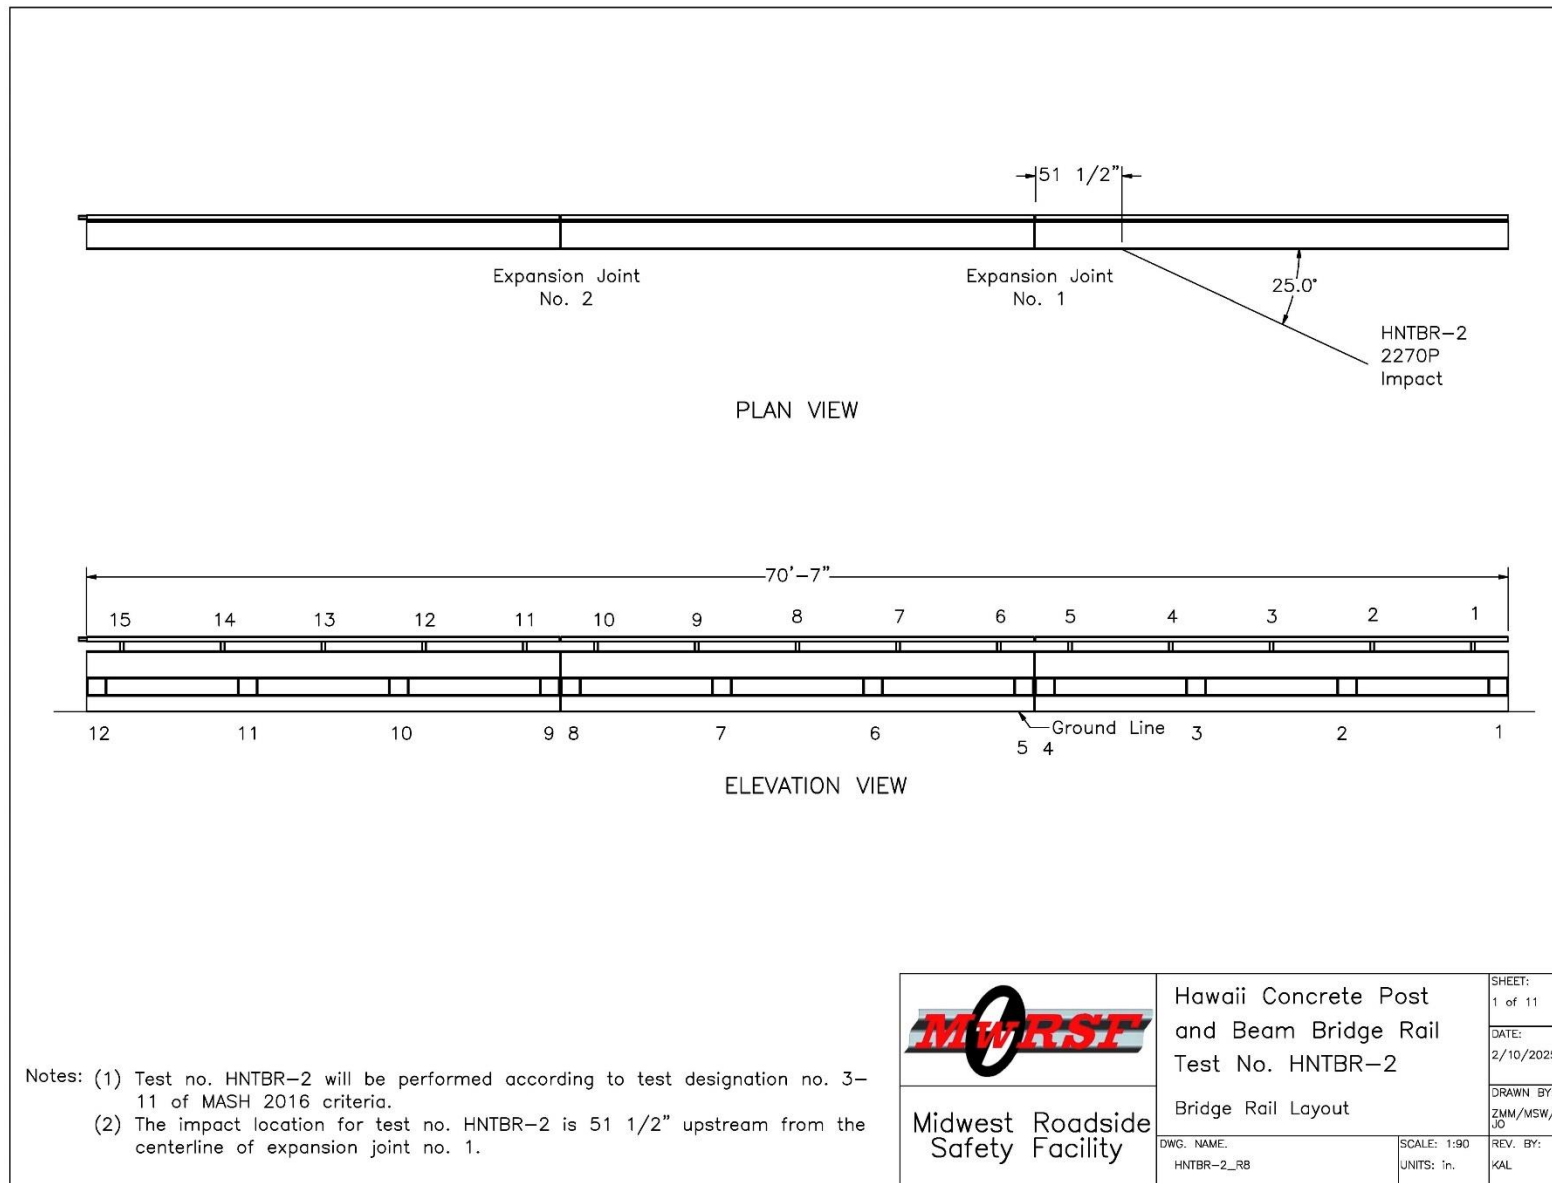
Test Installation Layout, Test No. HNTBR-2
